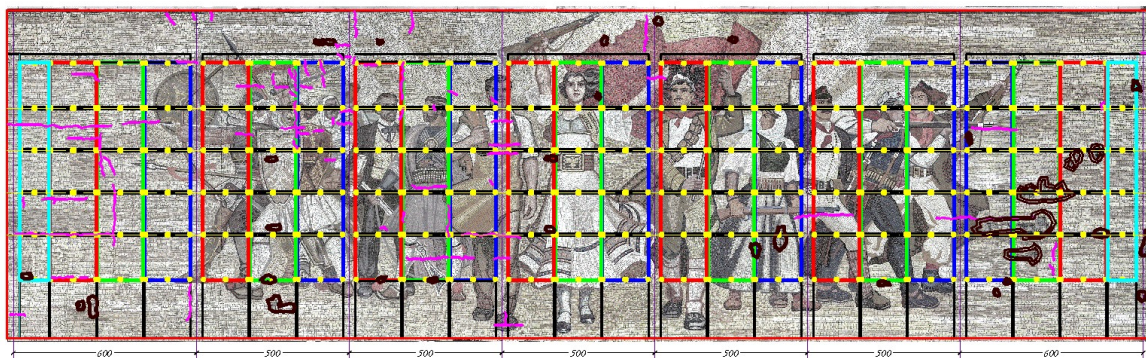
Cracks and spalling of concrete (---) Cracks (-----) Spalling
